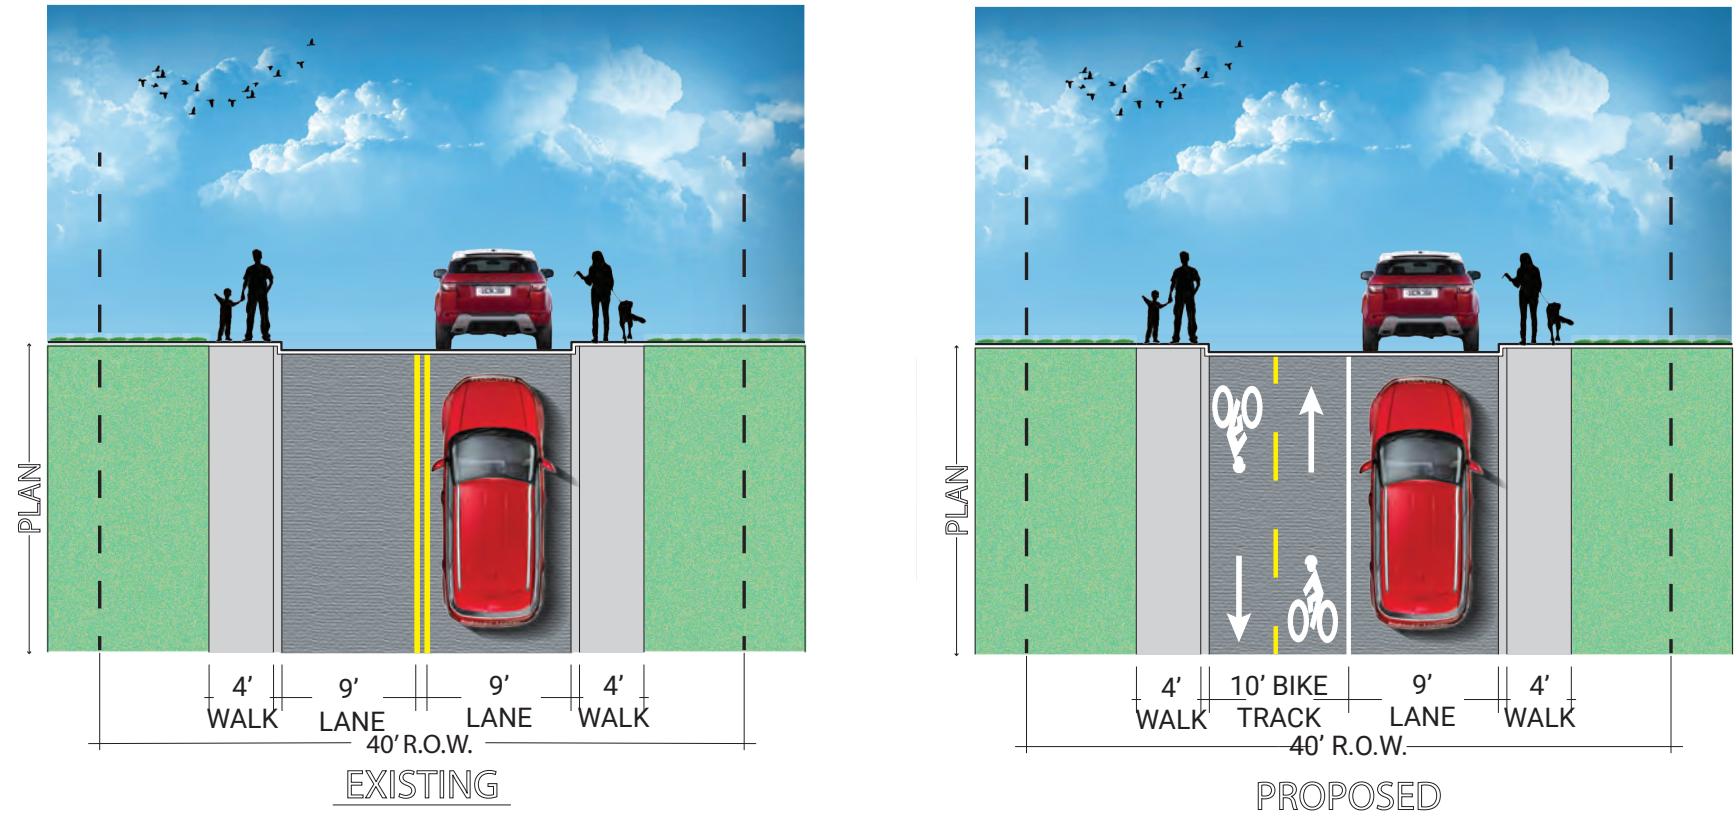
Project T-04, Washington-Lawrence One-Way Conversion Option Typical Section.
